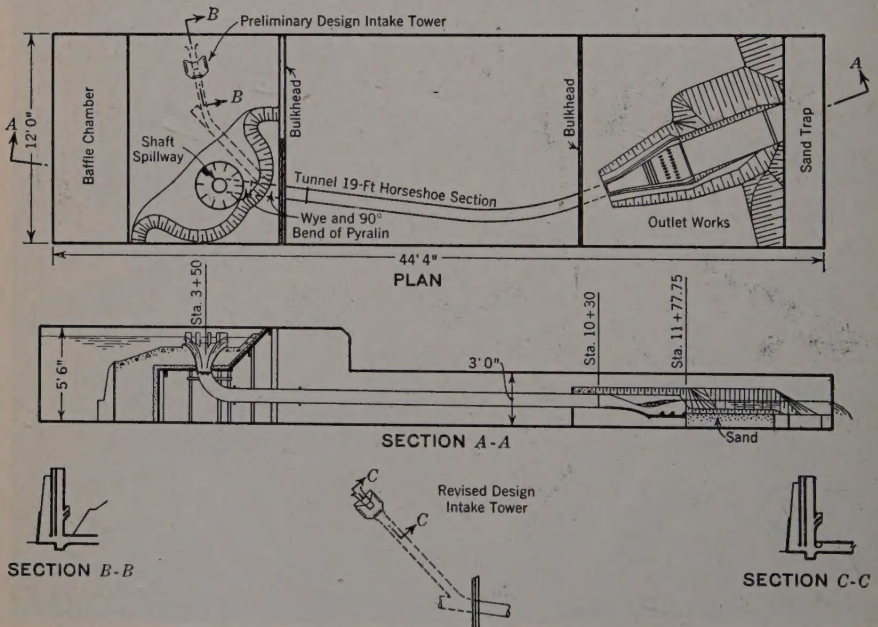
MODEL LAYOUT, PLEASANT HILL DAM
